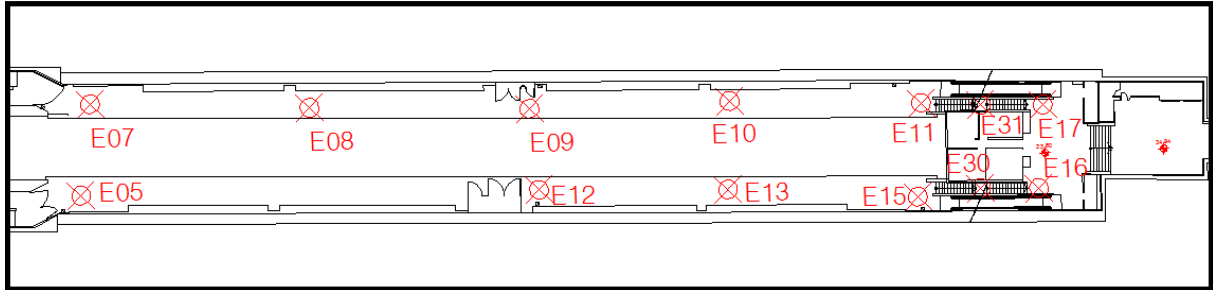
Scan Placement Location Drawing (railways, platform and access stairs area).
